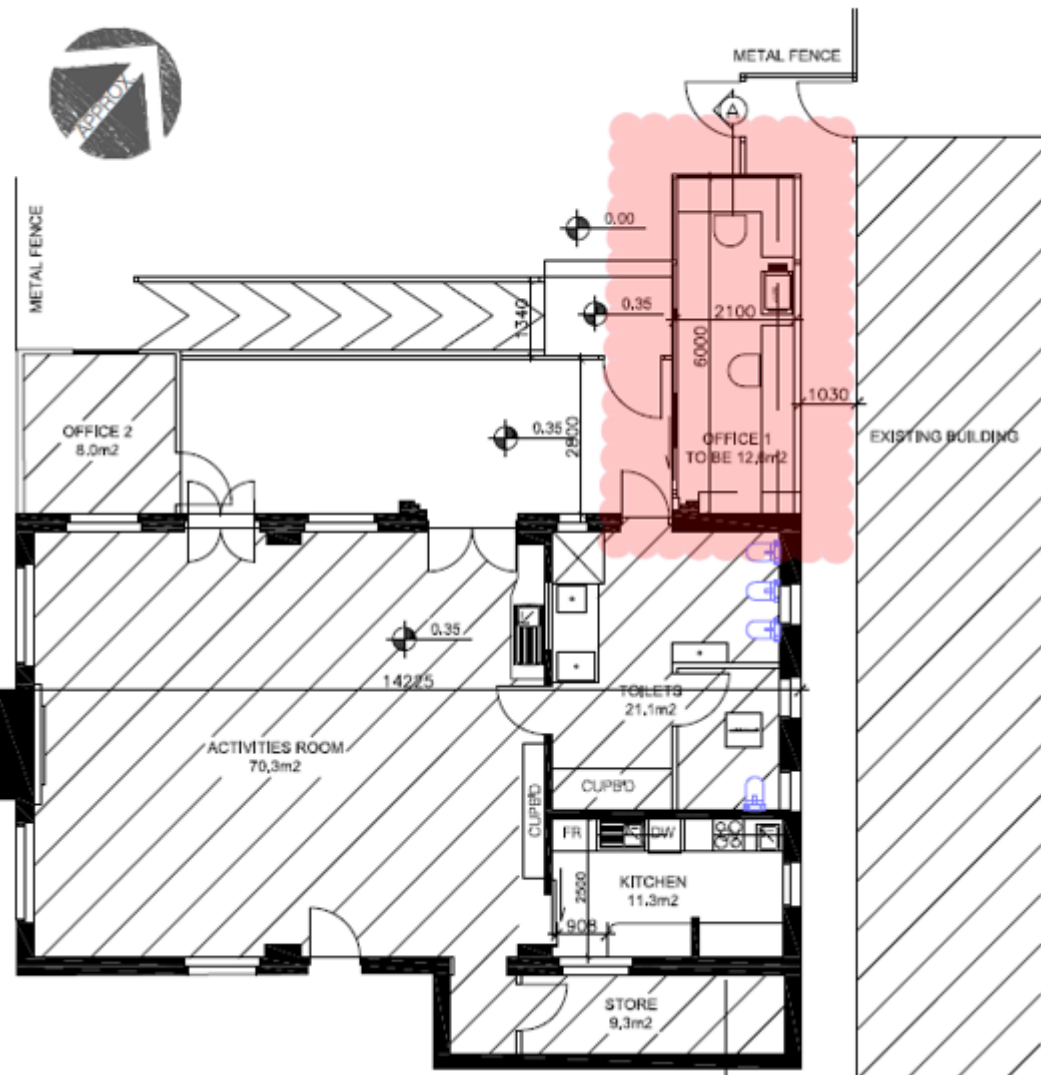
Floor Plan, administration office to be extended highlighted in red.
